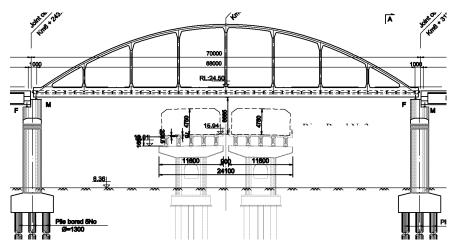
Ring Road No.3 Intersection
